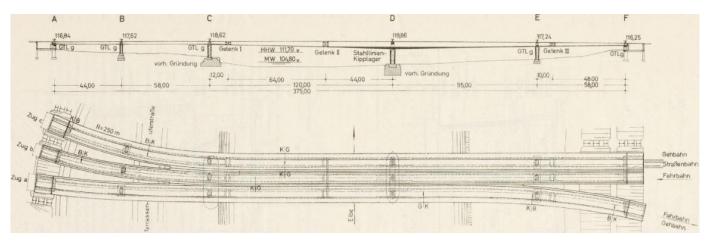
Longitudinal section and ground plan of the Carola Bridge, from [2].
